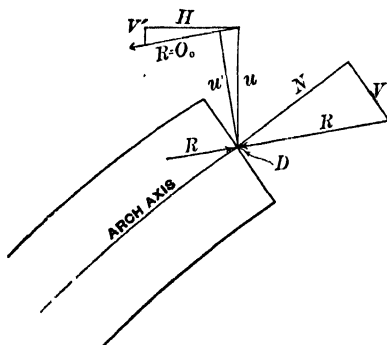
Forces Acting upon an Arch Section. (See p. 724.)
